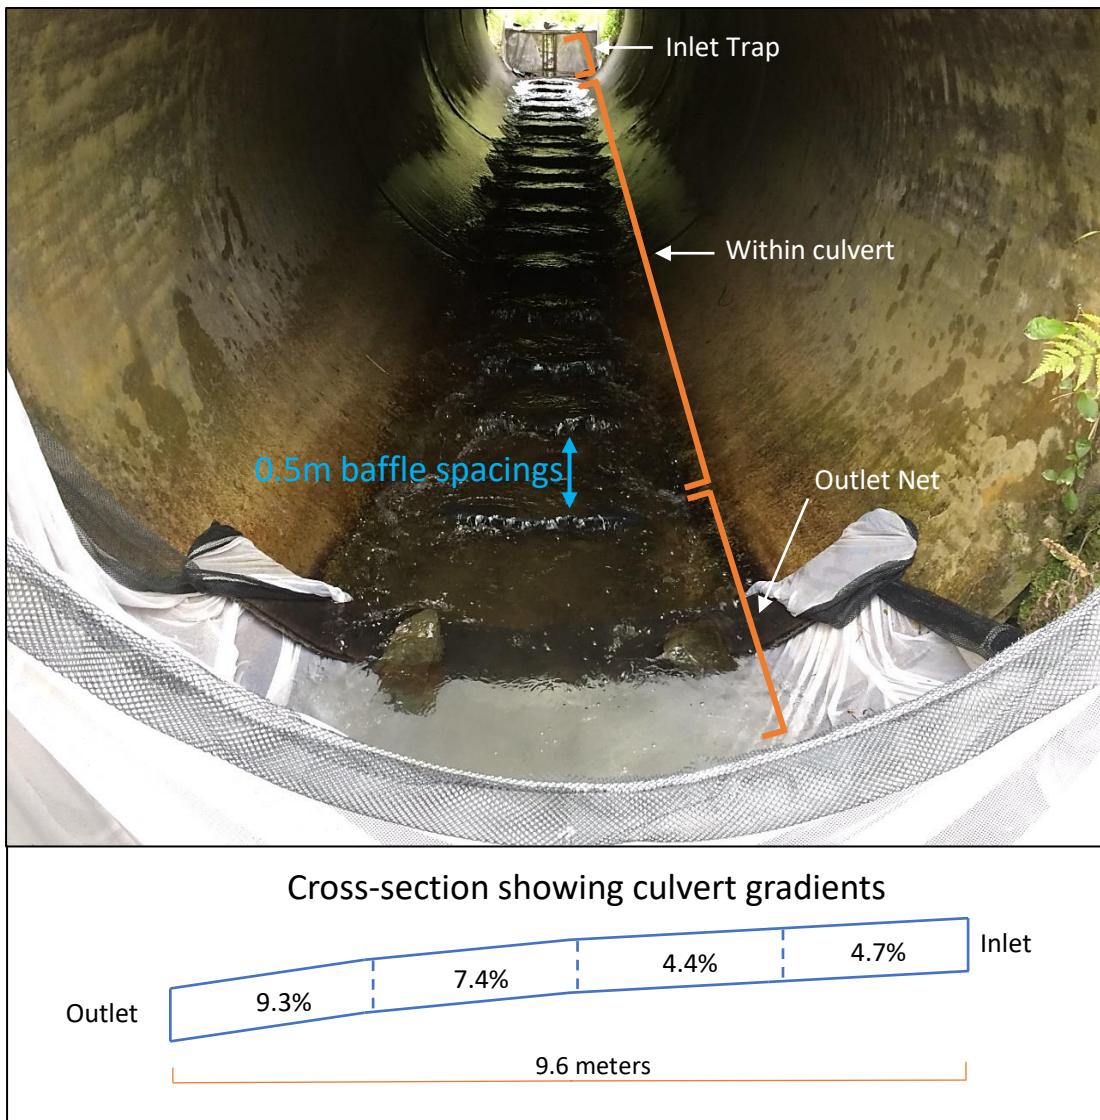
The orange bars show the three portions of culvert (outlet net, within culvert, top trap) used to assess how far inanga travelled through the culvert. The blue arrow indicates the distance in meters between baffles. The below cross-section shows how the sections of culvert, each measuring 2.4m in length, change in gradient from outlet to inlet.
